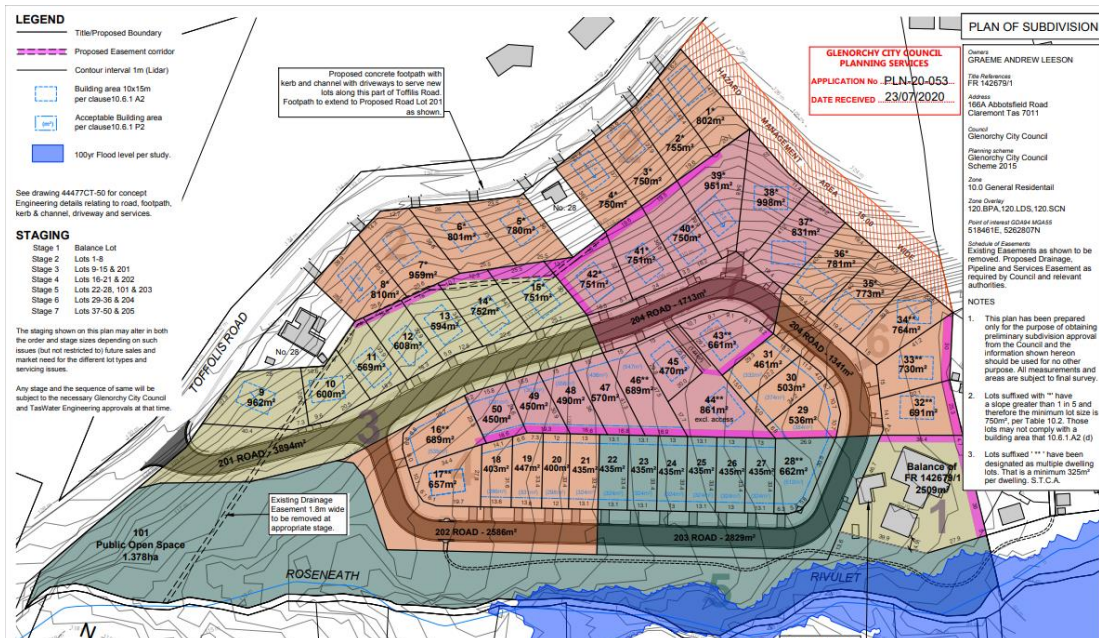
Proposed Plan of Subdivision showing lot layout, staging, road and public open space.
